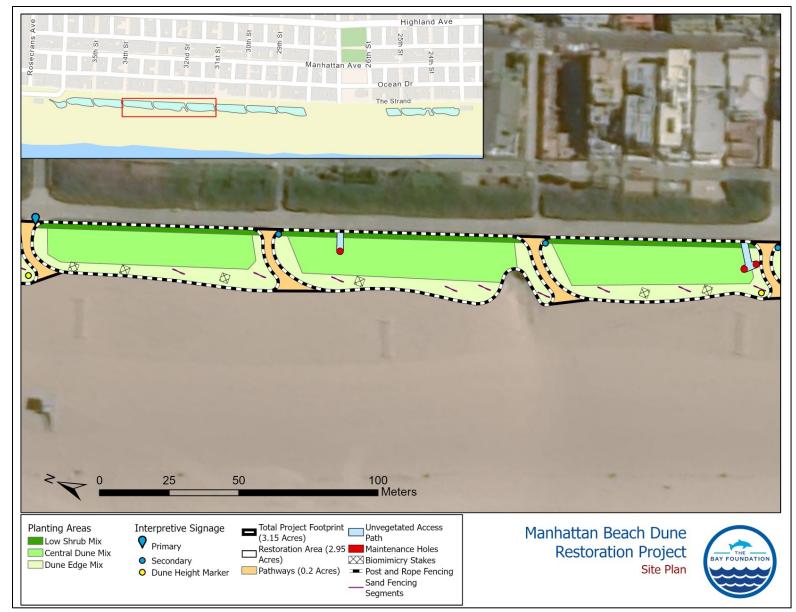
Project site plan (block 2 of 4) from 31<sup>st</sup> to 34<sup>th</sup> Street.
